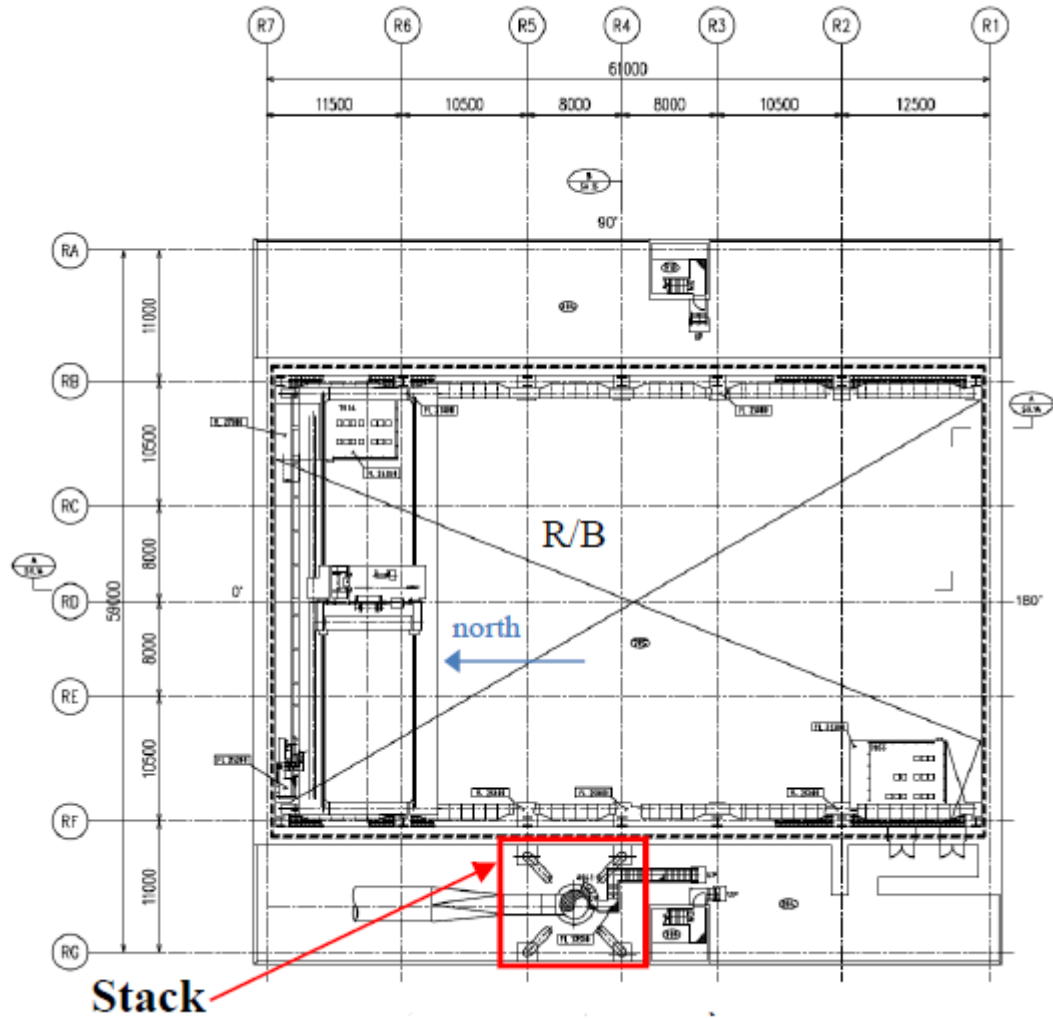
Plan, R/B Roof showing Stack Location
